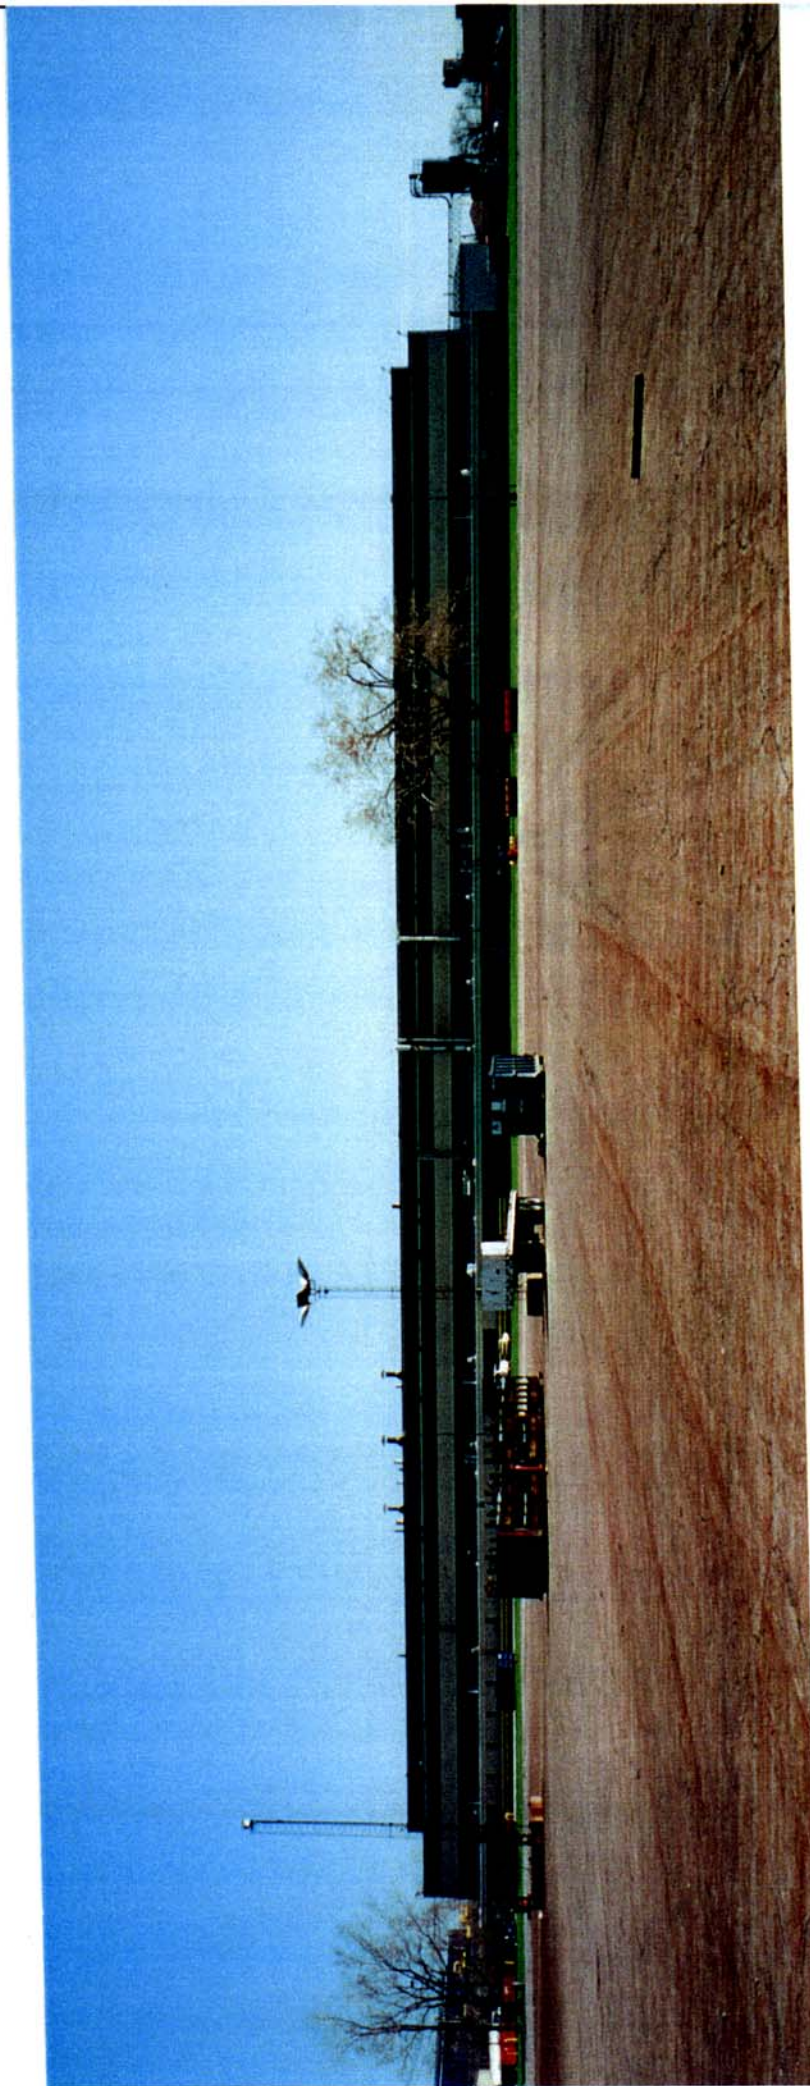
Central section and east bay of south elevation, facing northeast. Note main section has three rows of continuous metal sash. The areas between each sash course are clad with asbestos shingles.
